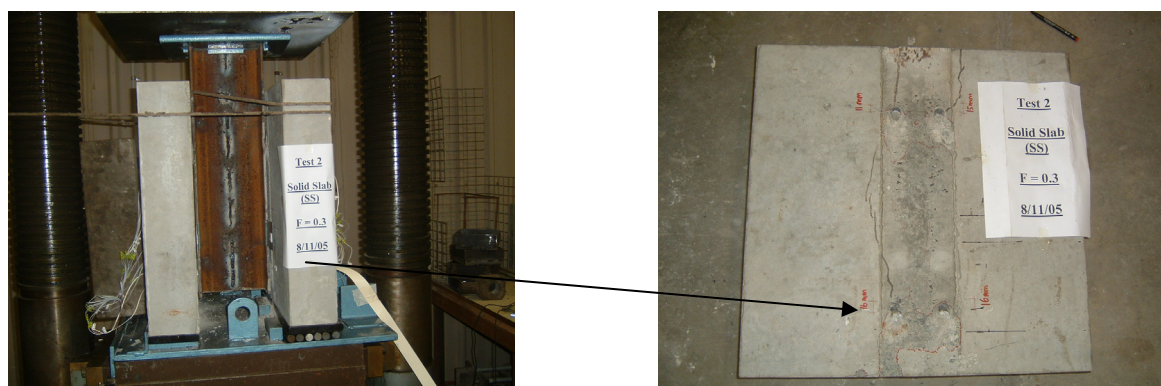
Concrete Damage at the Base of the Shear Connectors for Concrete With $F=0.3$ Fibres
